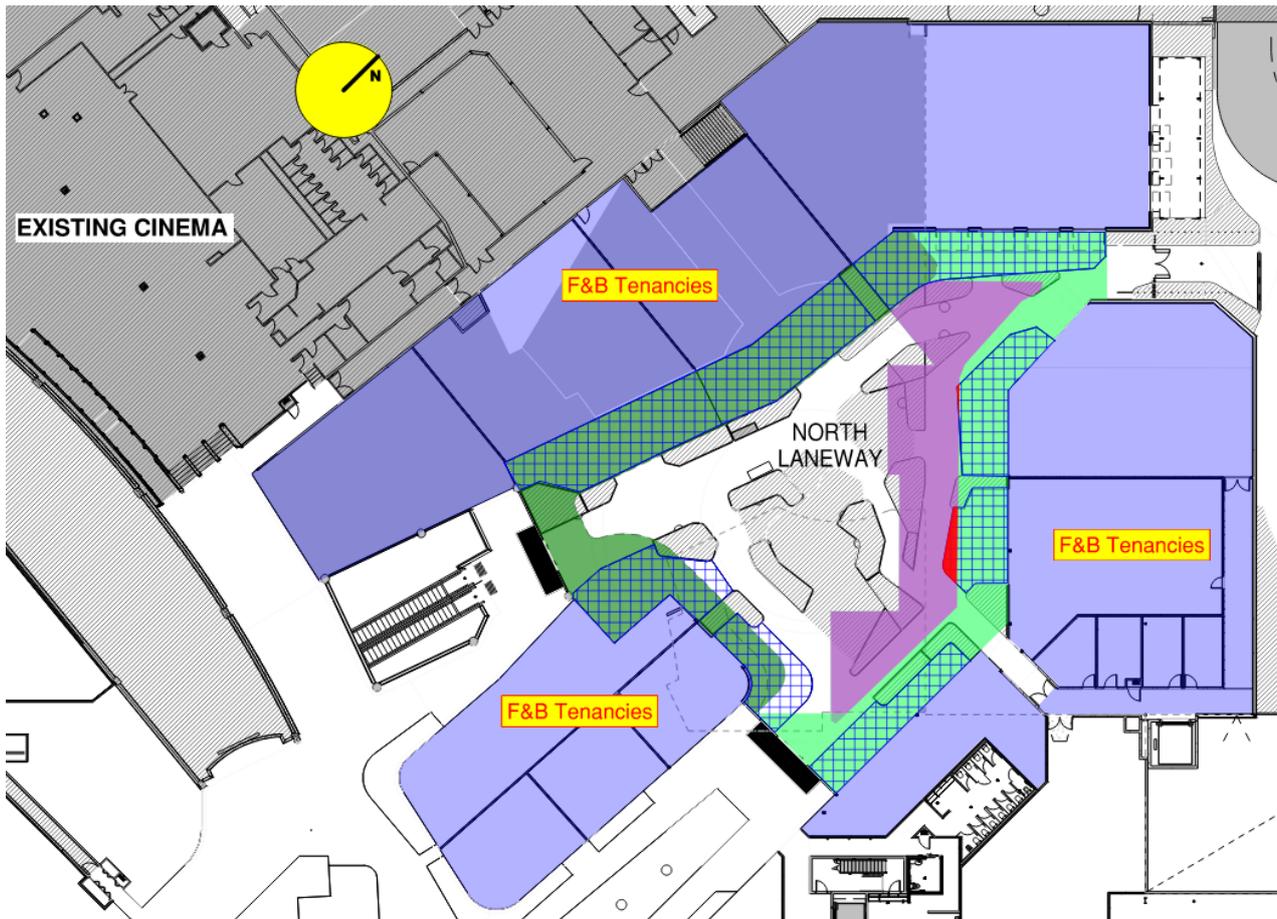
North Laneway layout and extent of sprinkler protection to canopies
